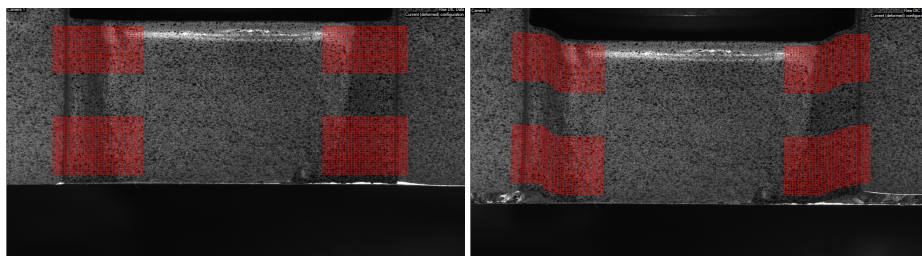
Example of images taken during the dynamic tests. These images are from the test specimen with longitudinal fillet welds
